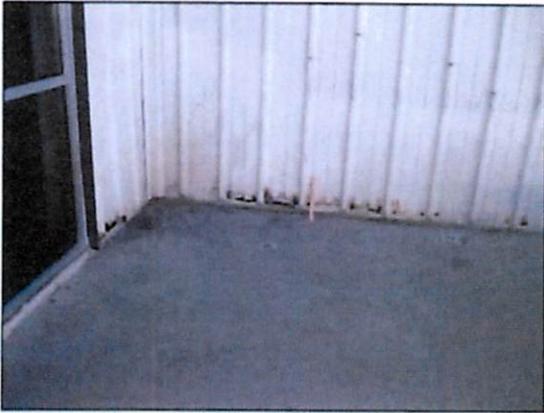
Recreation Yard, rust/deterioration on metal exterior, southwest corner common with Room 1
